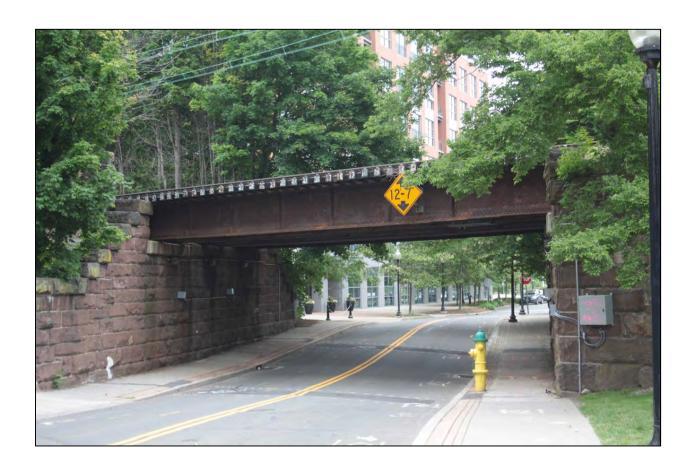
Marshall Street Bridge, south abutment and wing wall, camera facing southwest.
